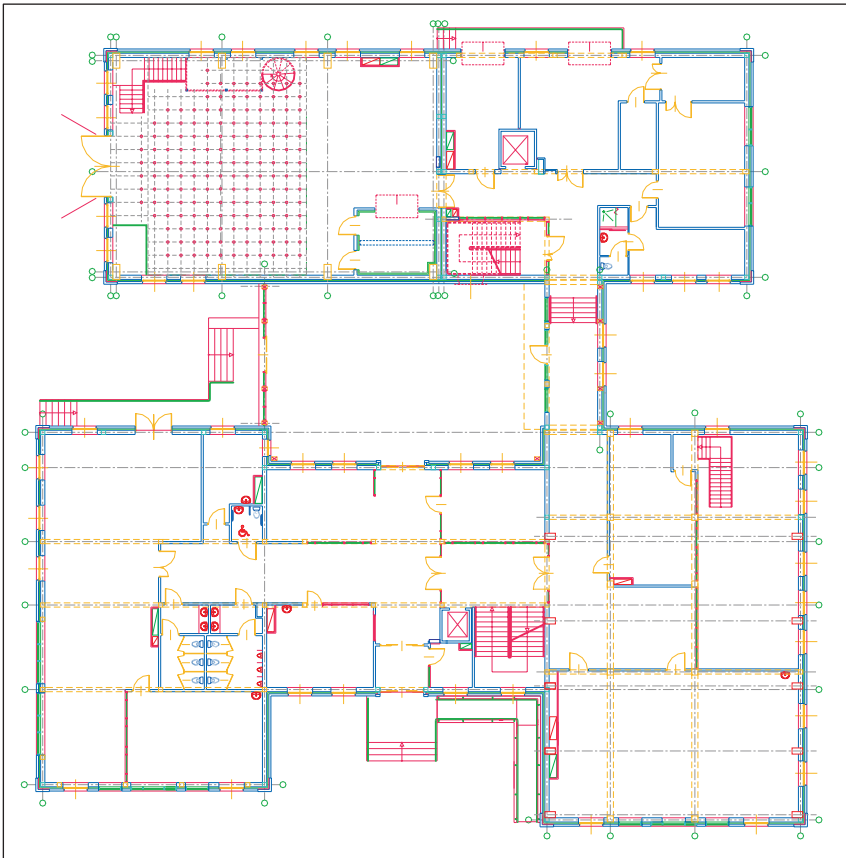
The ground floor plan. Author: M. ZAGROBA
